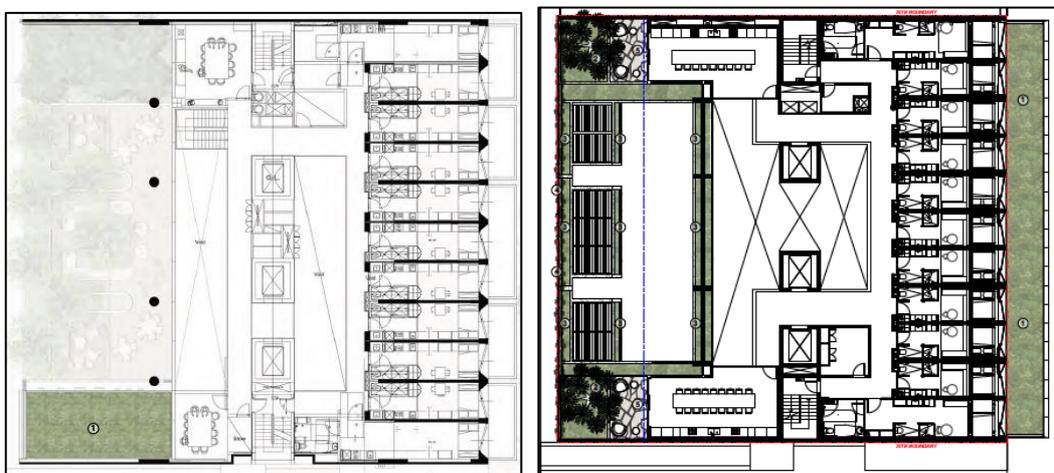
Approved Landscape Design (Left) and Proposed (Right)
